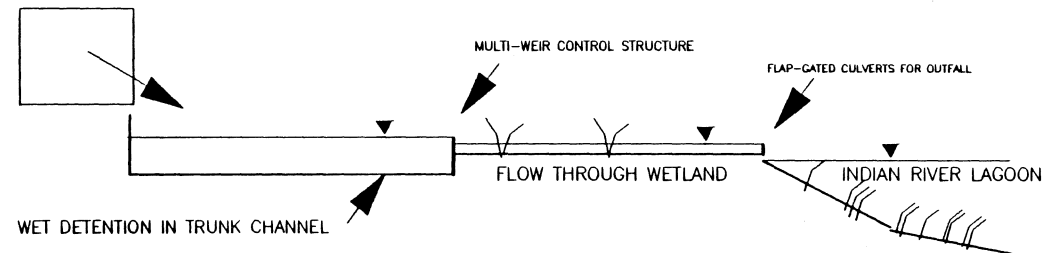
Schematic Plan for the Proposed Demonstration Scale Watershed Control System.
